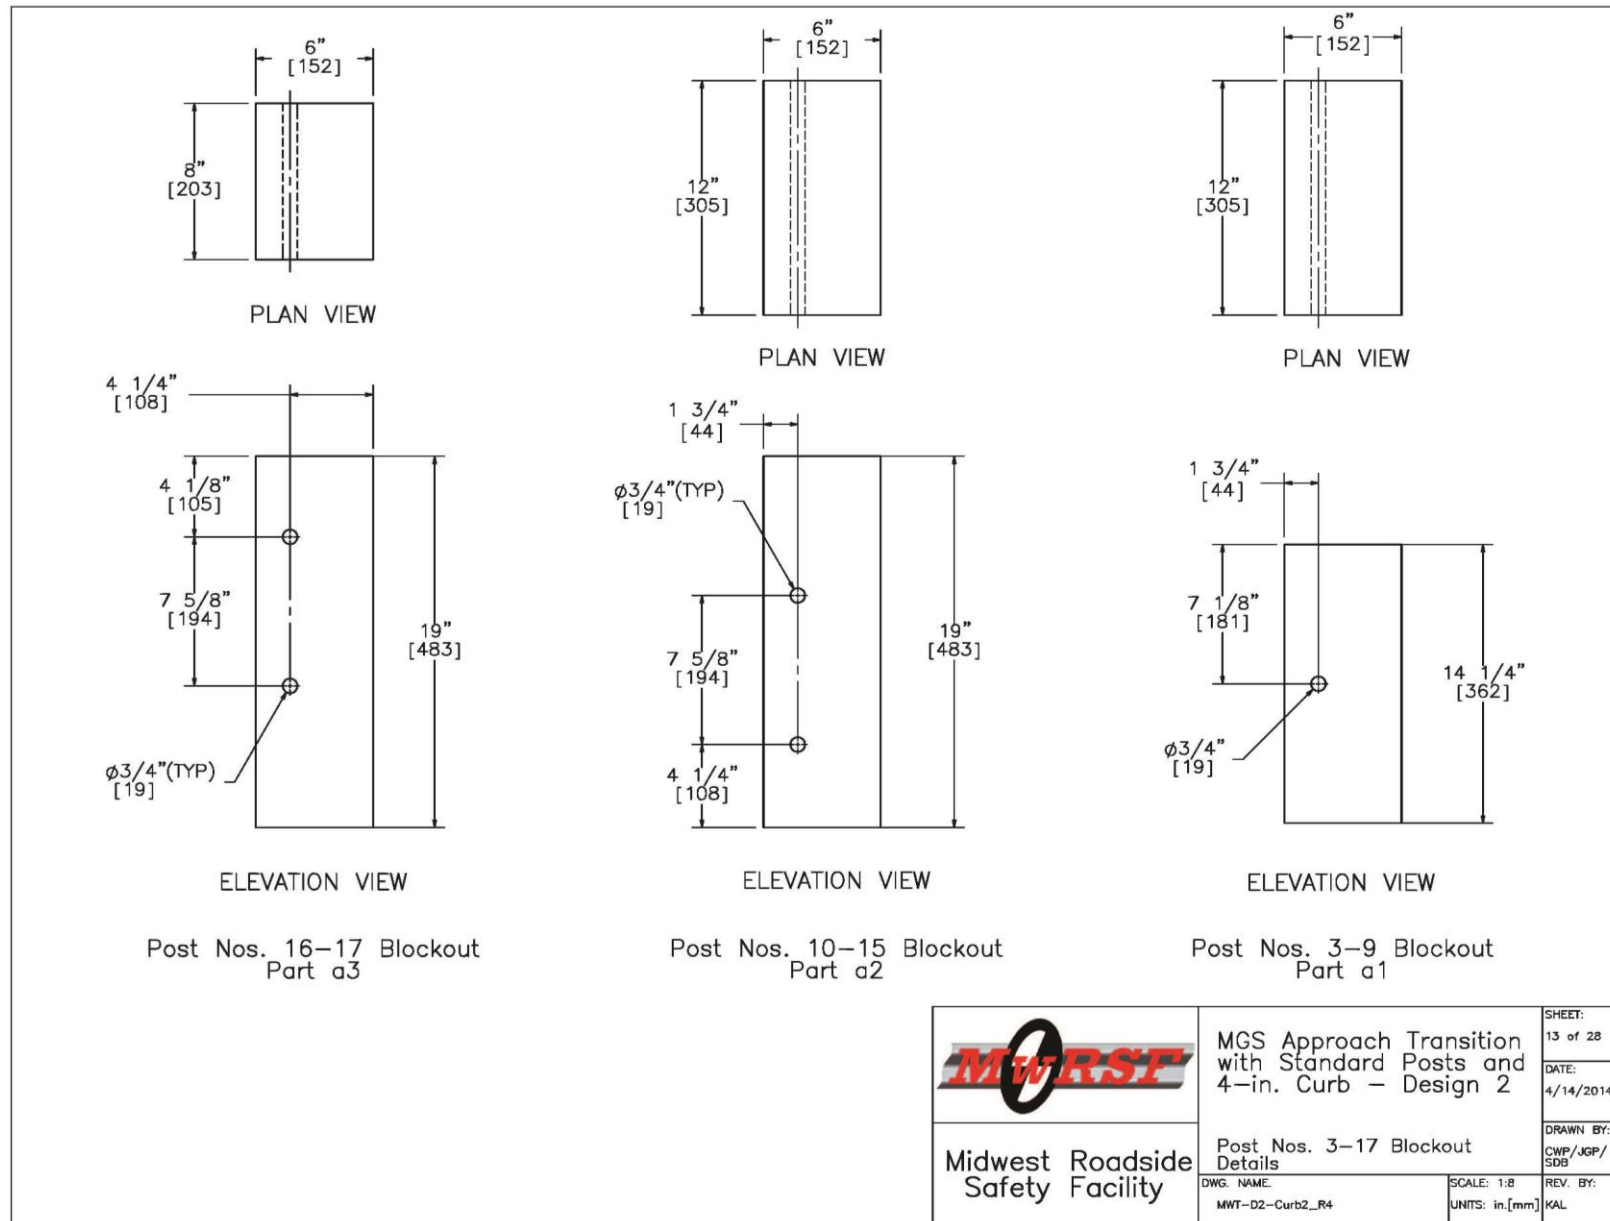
Post Nos. 3 through 17 Blockout Details, Test Nos. MWTC-2 and MWTC-3
